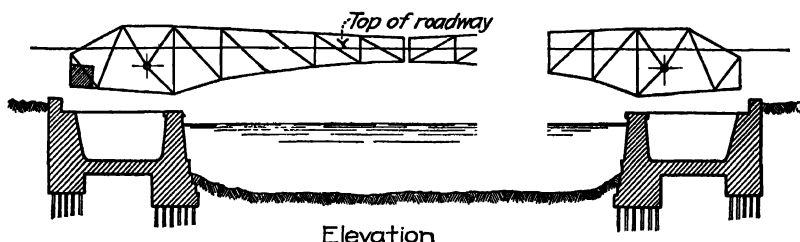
Erie Street Bridge, Chicago, built 1910.
